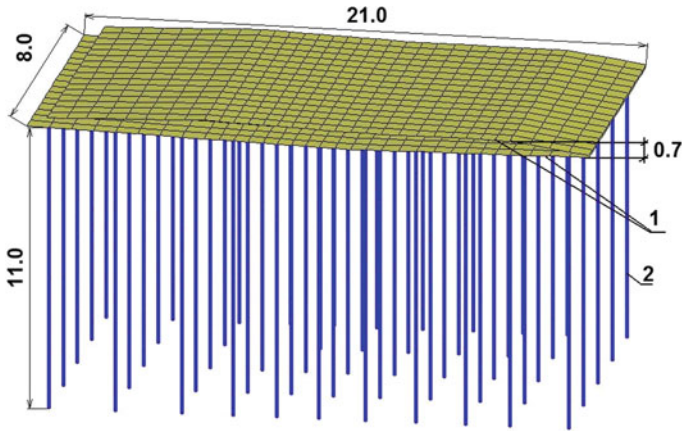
Construction of a low-settlement embankment on the approaches to the bridges: 1—two layers of Tensor geogrid; 2—reinforced concrete piles 11.0 m long and a section of 20 × 20 cm
